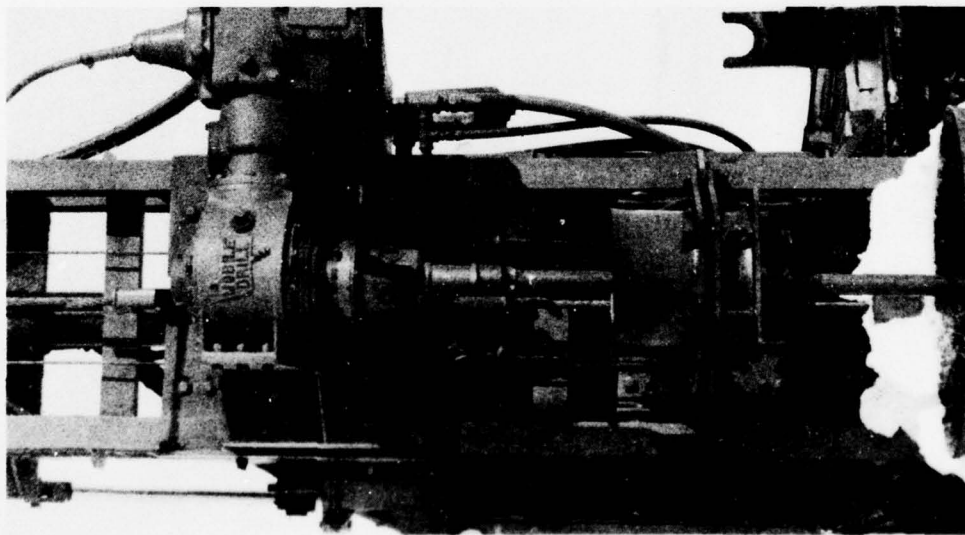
Drive head of Mobile Drill set up for auger drilling.
